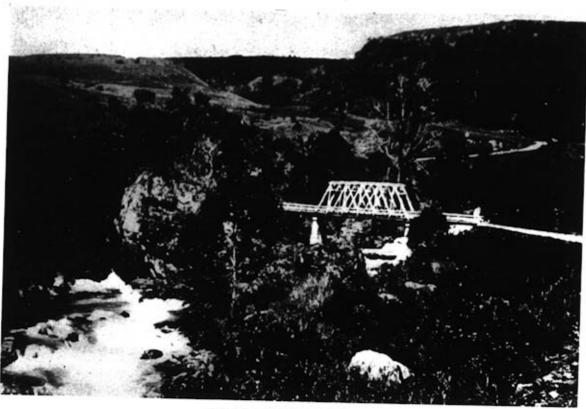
Bukidnon, Mindanao. Mangima Canyon Bridge between Tankulan and Dalirig, Sayre Highway.
